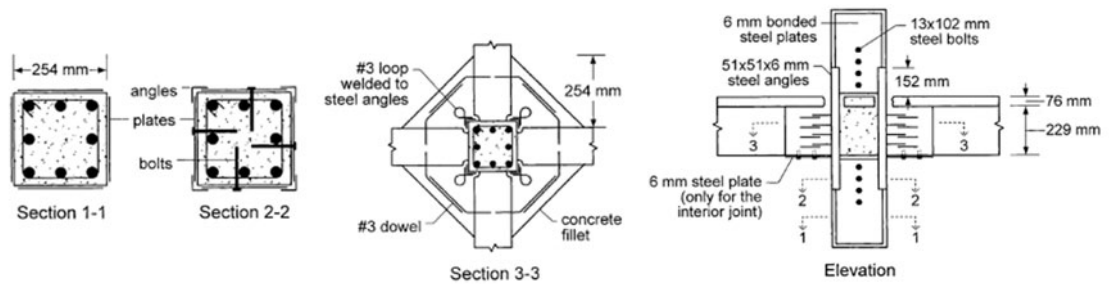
Reinforcement detailing used in the RC jacketing, Corzaao and Durrani (1989)
